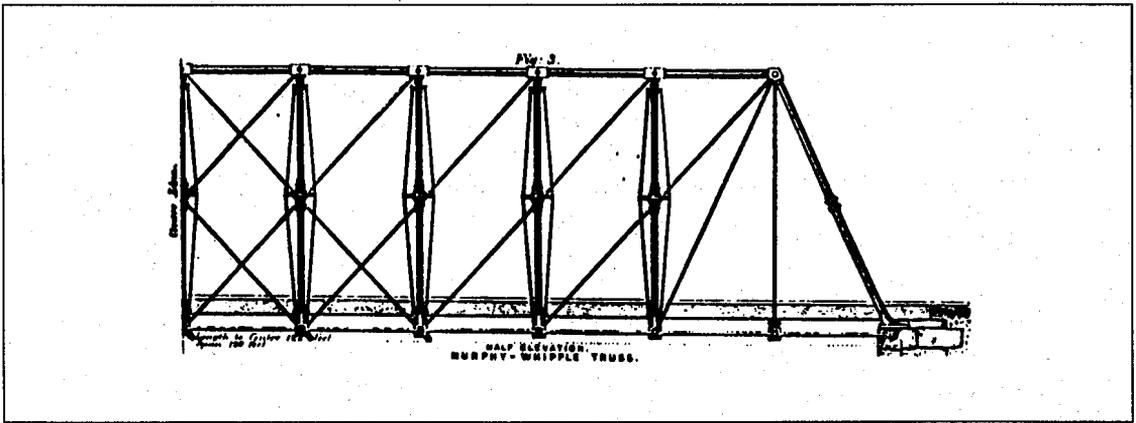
The "new" Whipple double intersection truss, replacing the double intersection Pratt.
